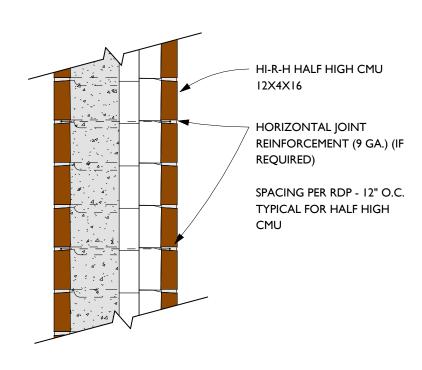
HI-R-H Half High - Bond Beam
